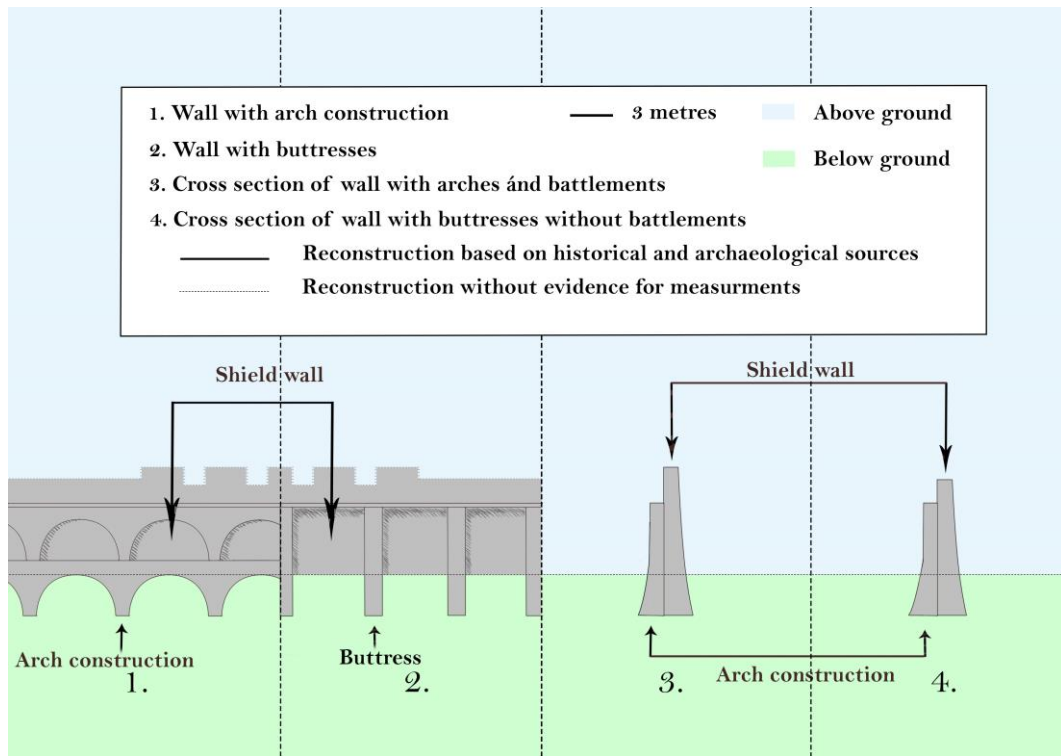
, possible reconstructions of the town wall based on excavation results and historical drawings, by author.
